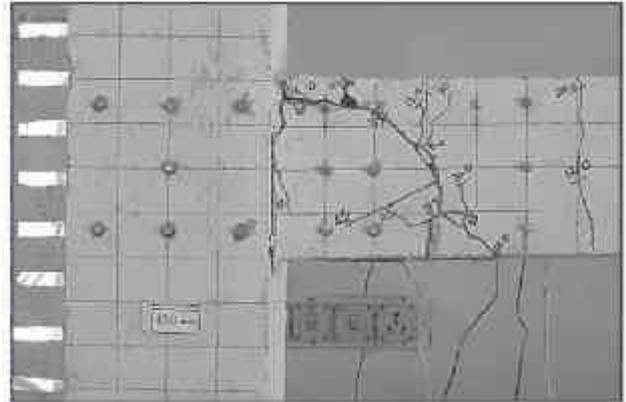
Crack Pattern MLJ 470 at Ultimate load
